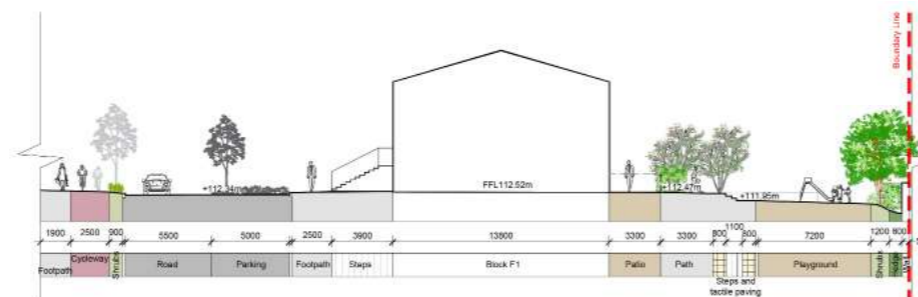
Landscape site plan showing & section Eastern Courtyard to Duplex Units
